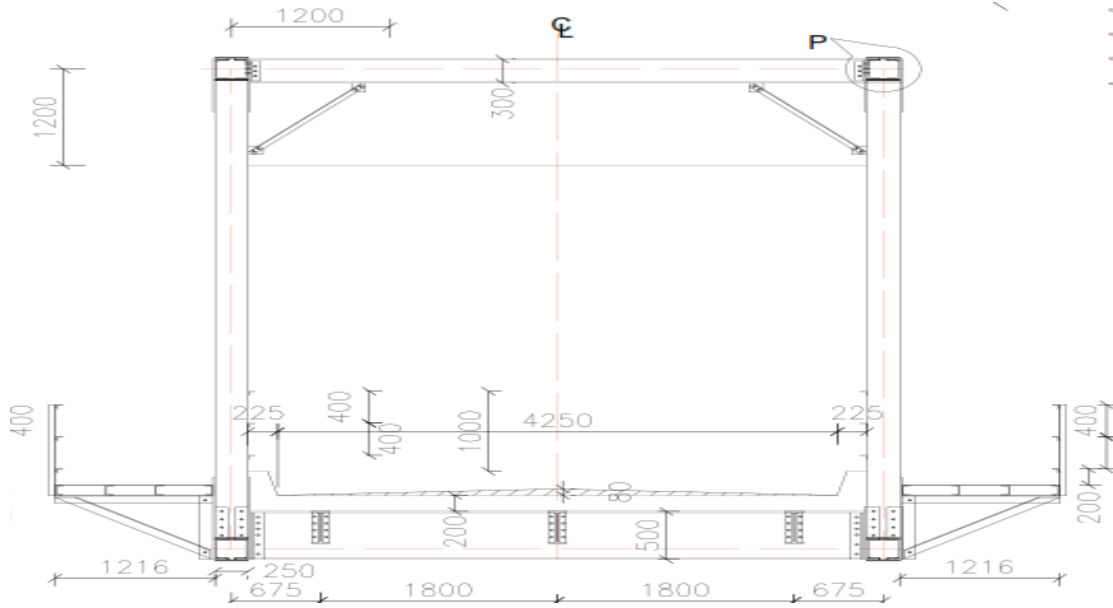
Typical Cross-section of a Single-lane Truss Bridge with Footpaths (30 m span)
